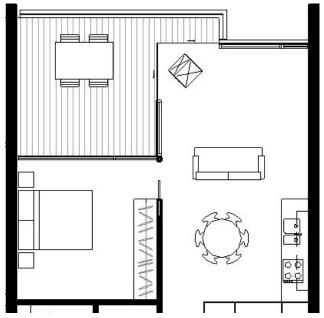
The corner of the apartment opens completely to create a flow of space between inside and outside.
